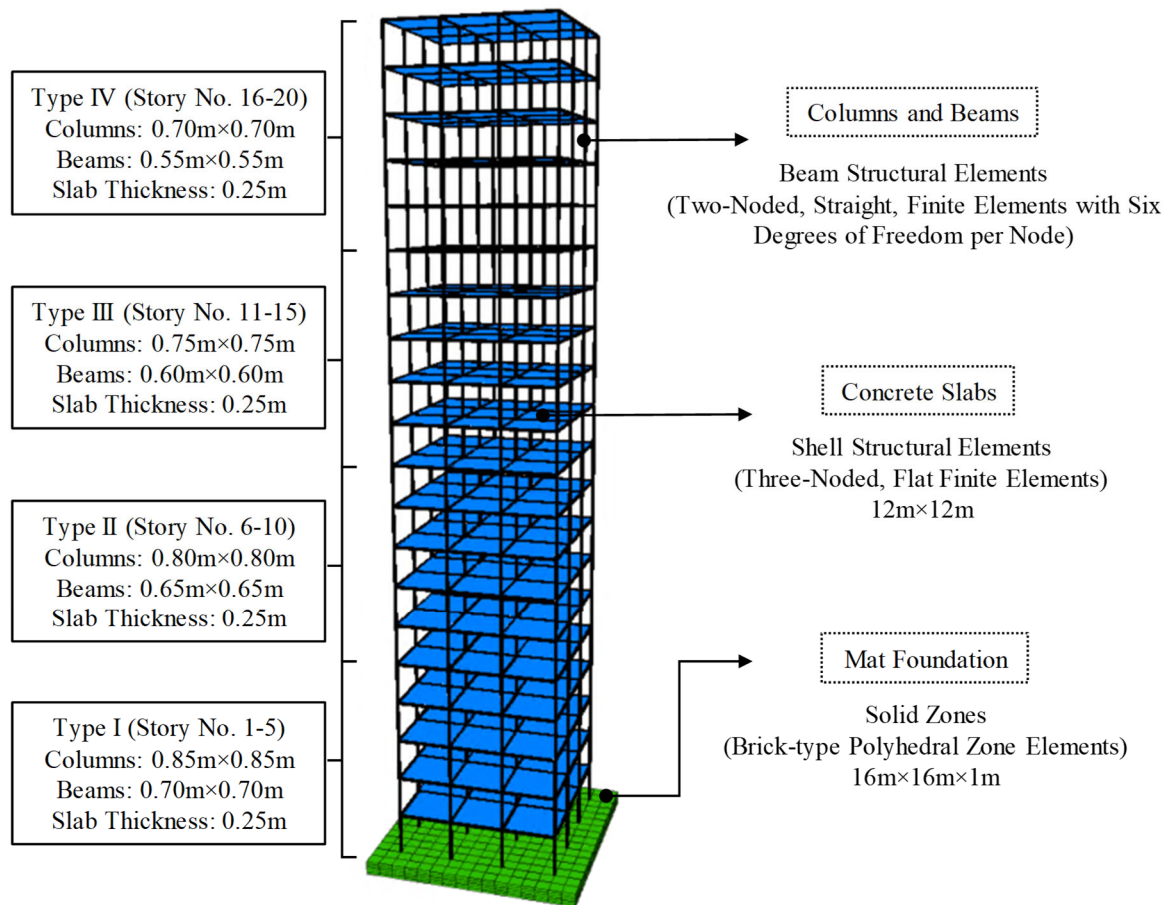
Details of designed structural sections of 20-story moment-resisting building and foundation
